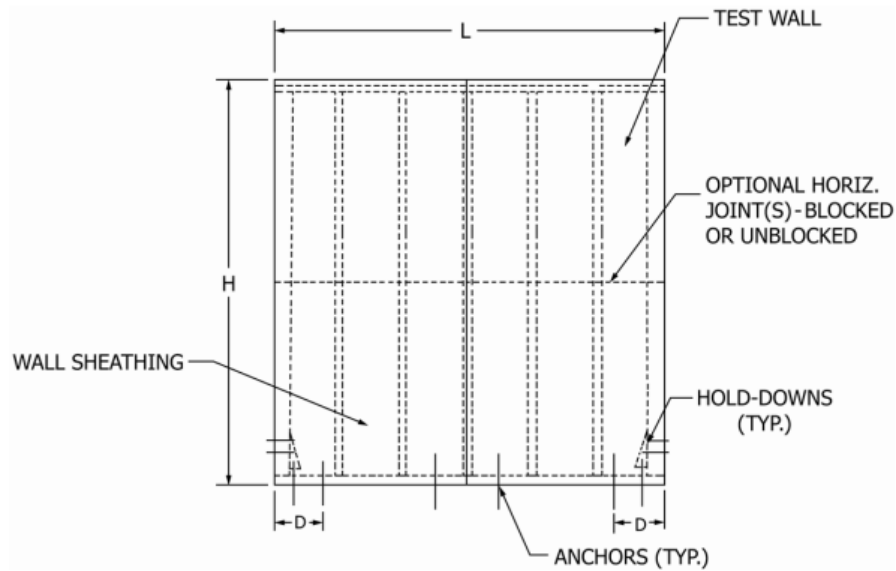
Shear Wall Configuration (ASTM E2126 2011)
